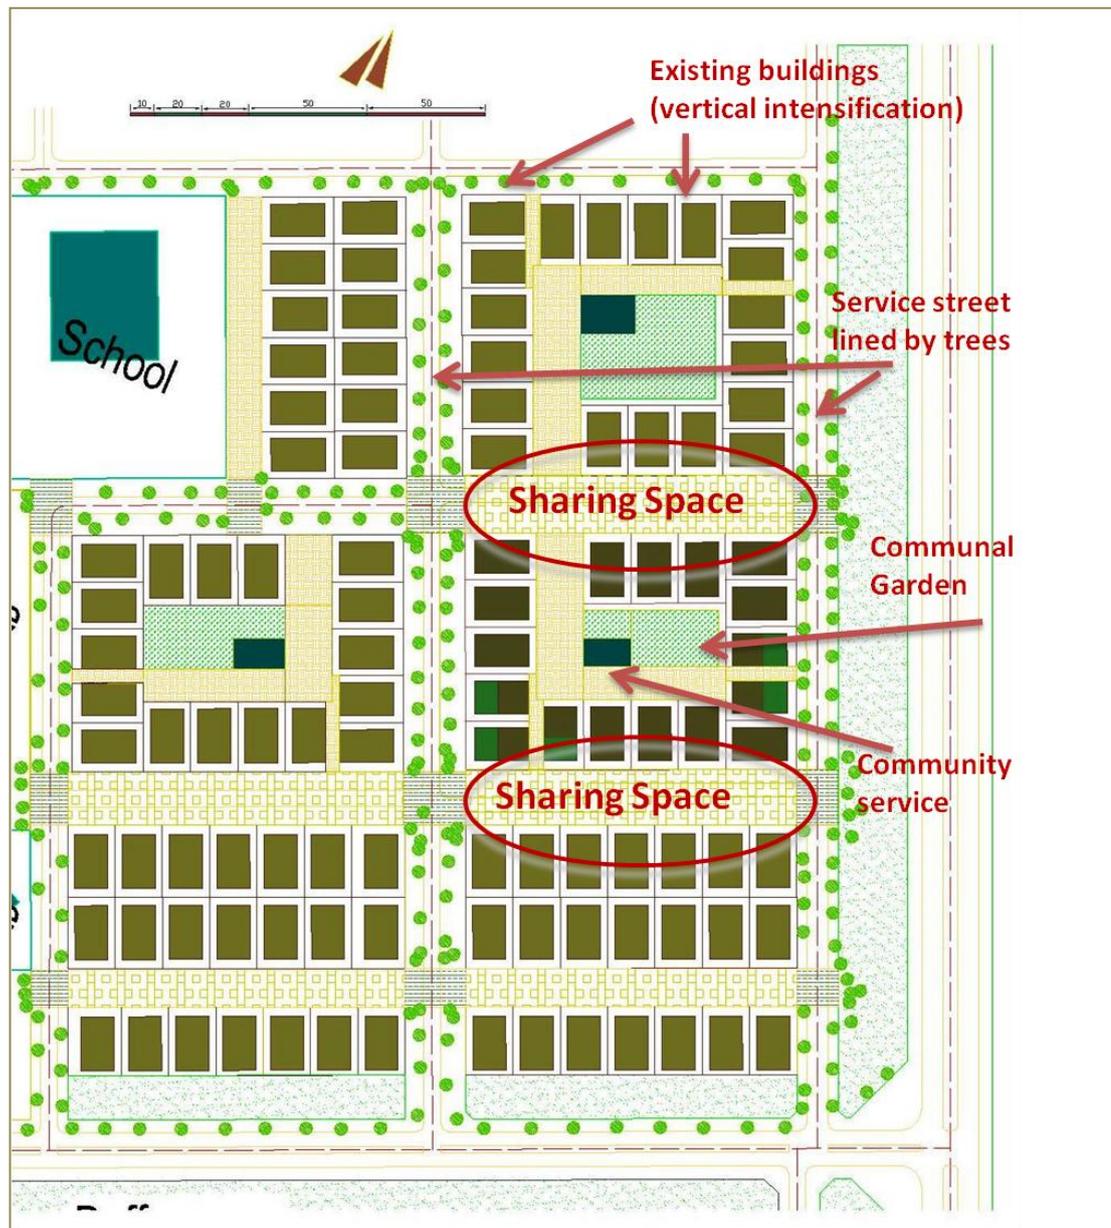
23: Layout Plan – Proposed Scheme, El-Muchkat-II
